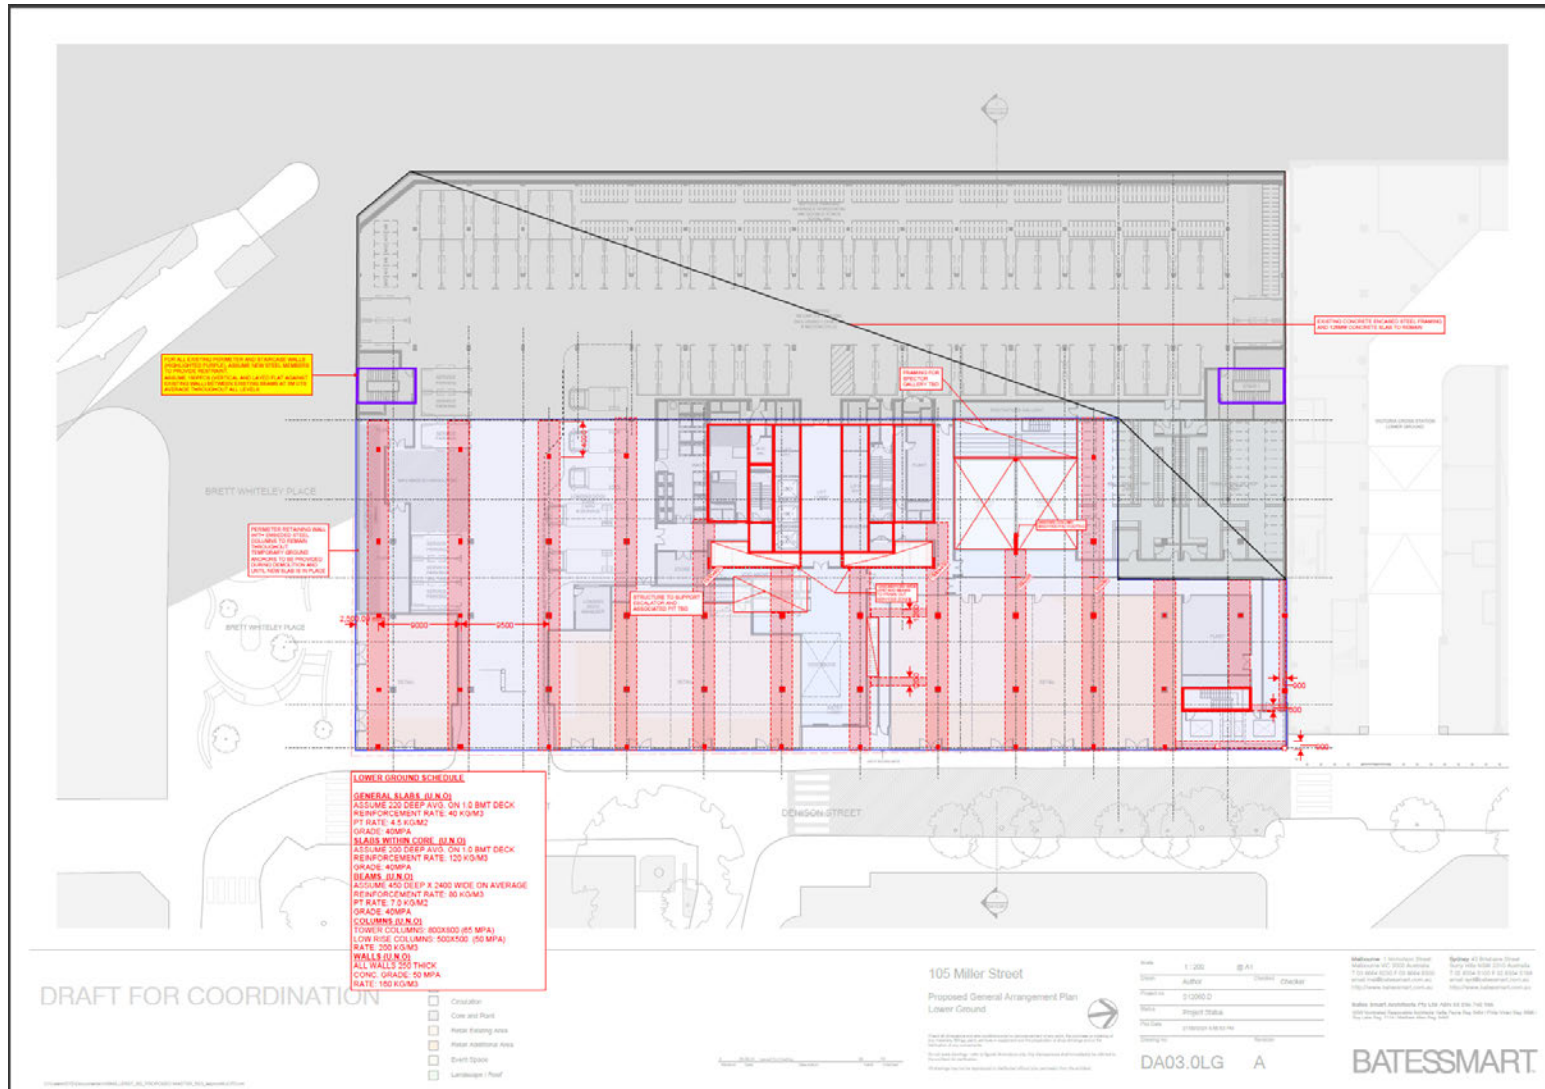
Proposed Site Plan for the 105 Miller Street Development - Lower Ground Floor. Note the western half of the building has been heavily excavated to create the lower ground floor, owing to the site's east-west slope. Together with the basement (Figure 6-3 below) nearly the entire site footprint has been excavated significantly below ground. Source: BatesSmart 2024
